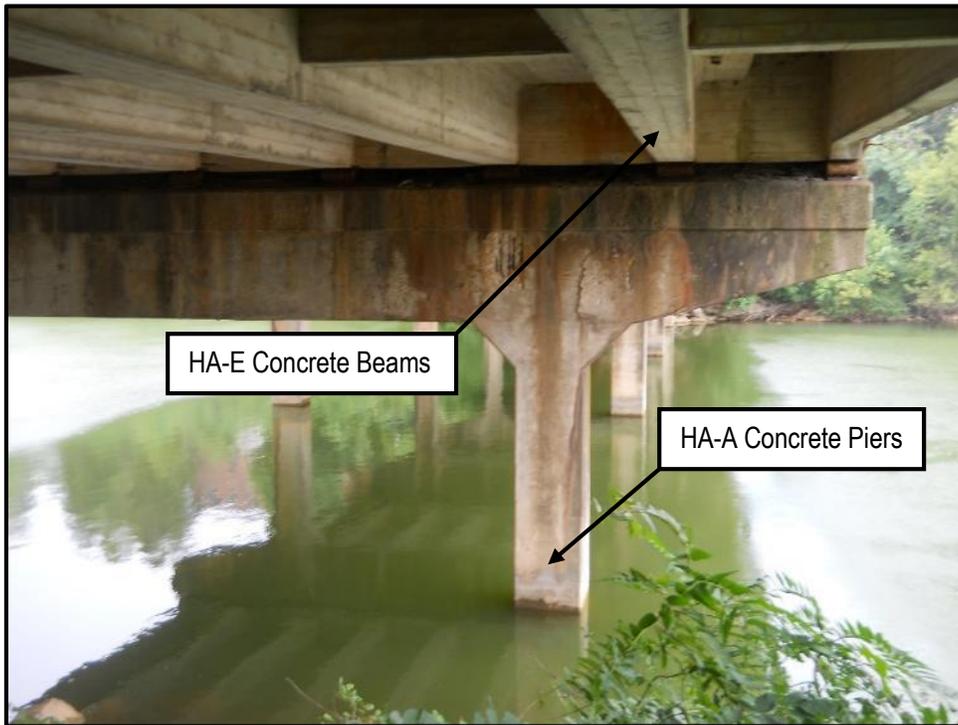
View of HA-A and HA-E from underneath the SR-16 Bridge over Boiling Fork Creek
